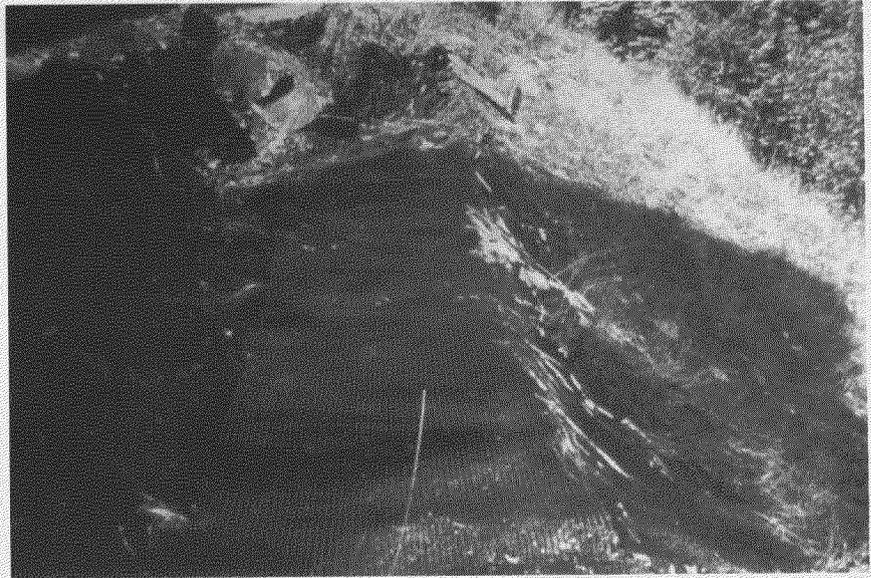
Workers placing internal reinforcement material (note: geocomposite drain behind backfill).
